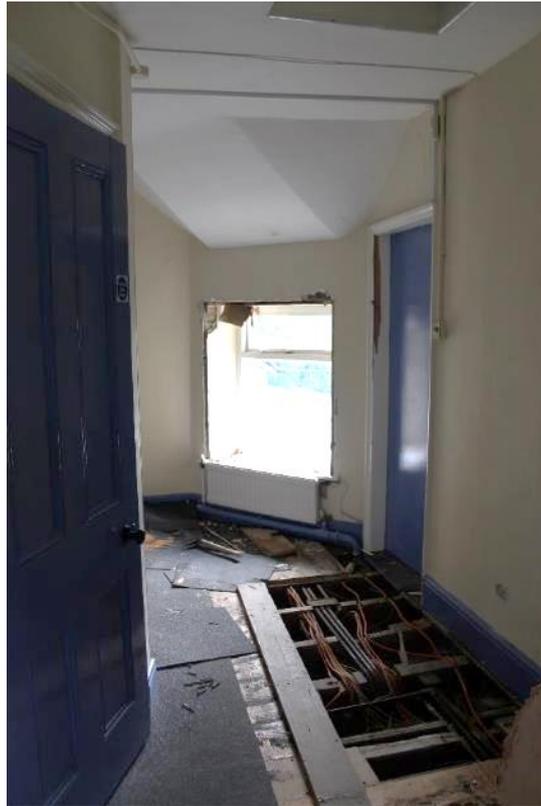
Looking east at splayed corner in southern corridor with window overlooking south yard
